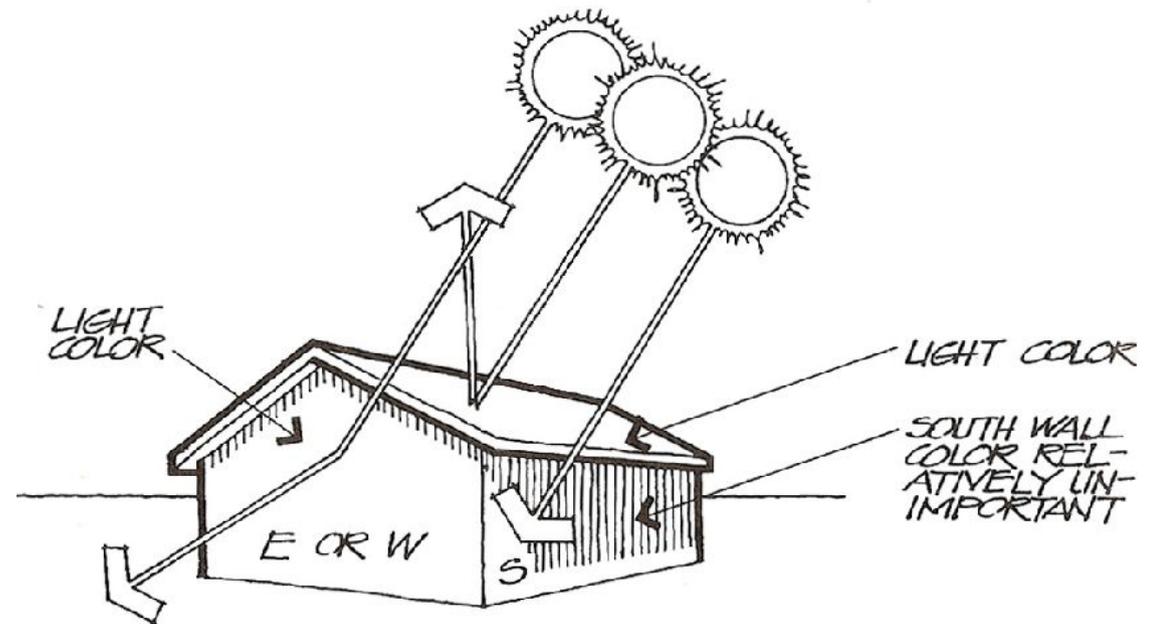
Above: High summer sun delivers greatest heat load to roof, east and west walls (the latter receive about half of a flat roof). South facade receives relatively little radiation—especially if there are even small overhangs.
